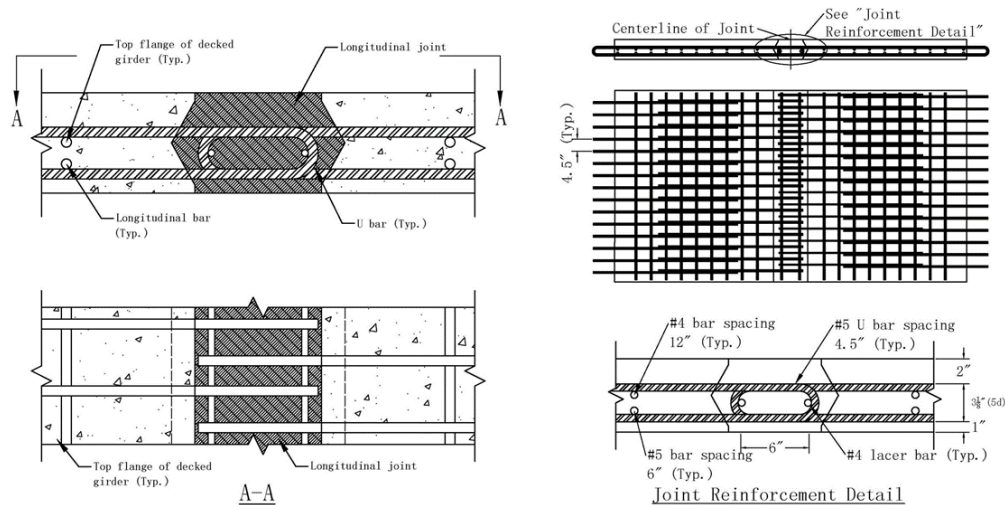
NCHRP 10-71 longitudinal panel-to-panel connection (French et al. 2011)
